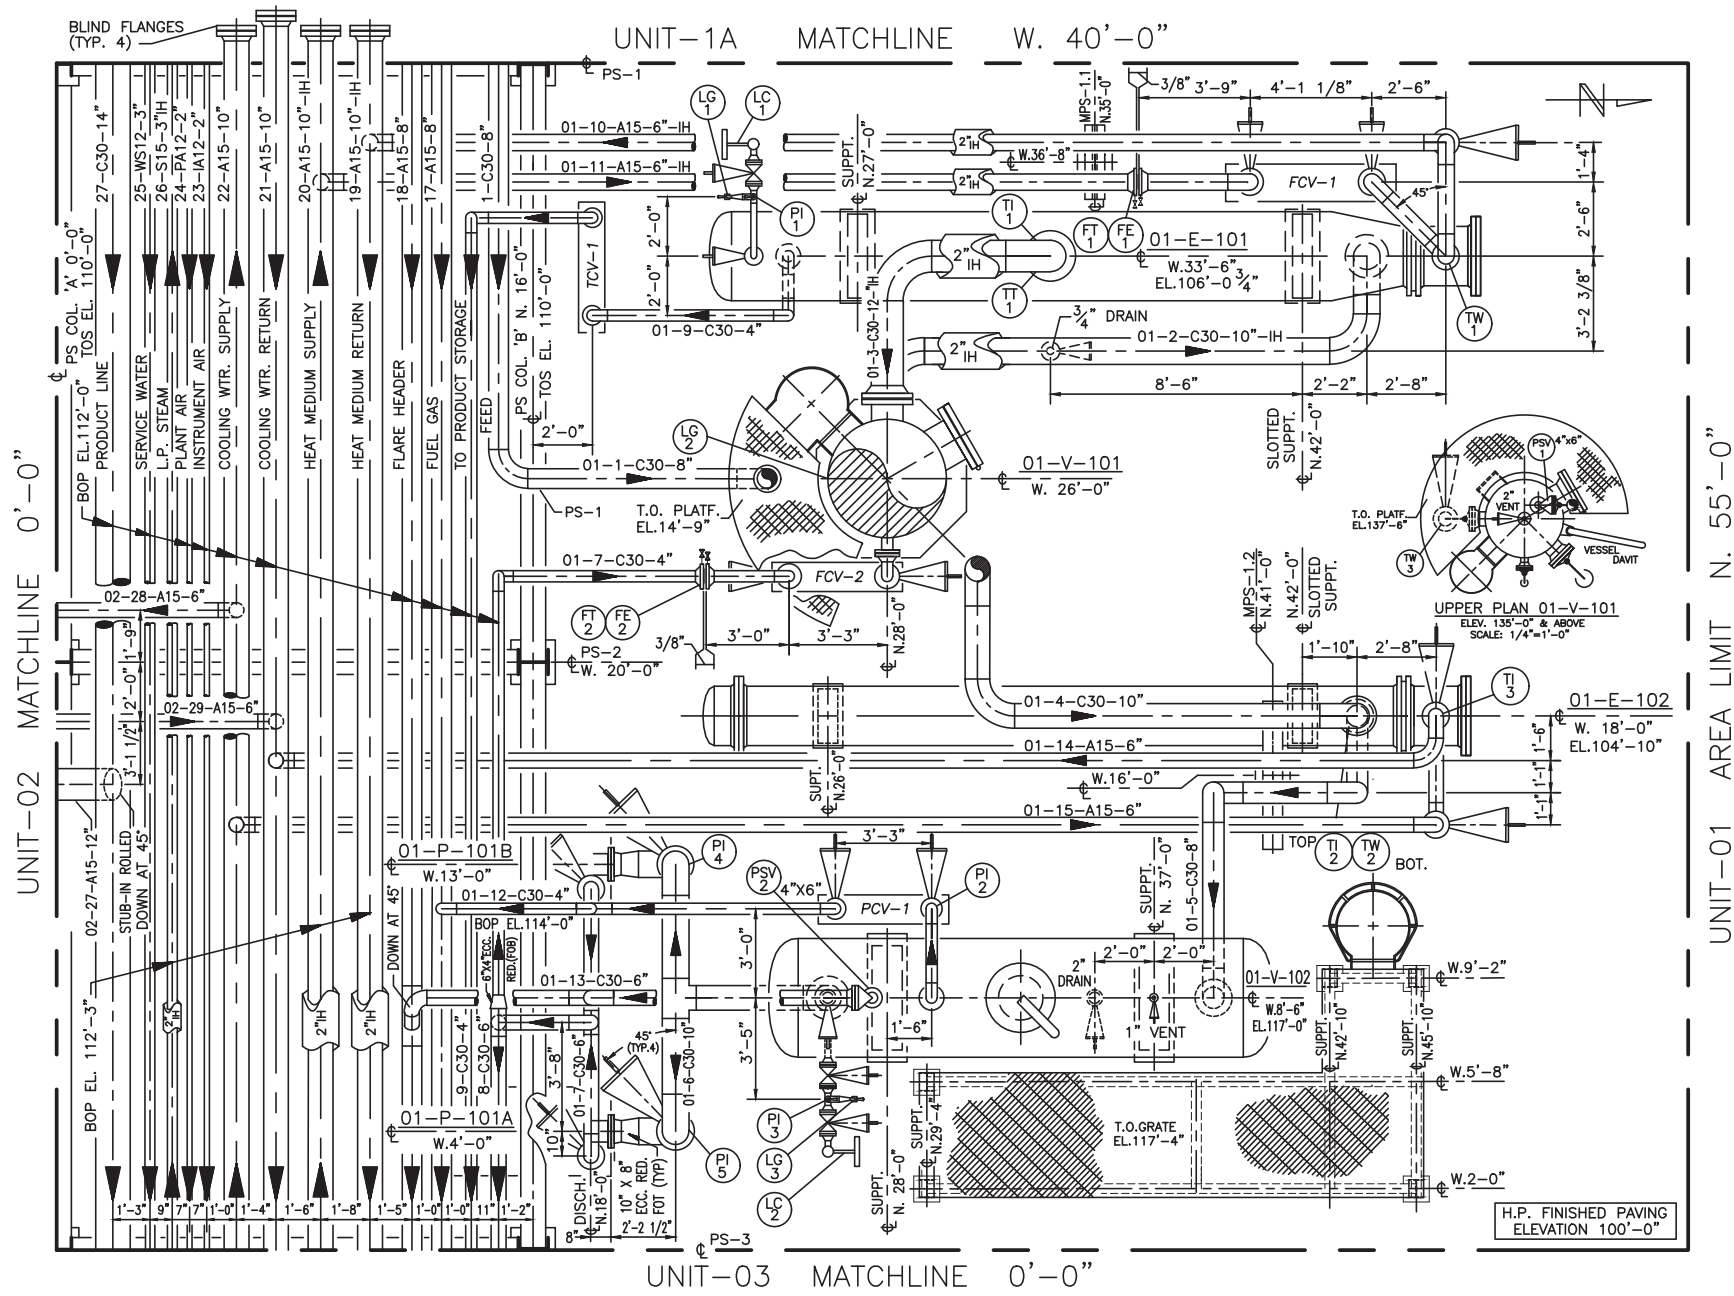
Unit-01 Piping Arrangement drawing; Double-line.
